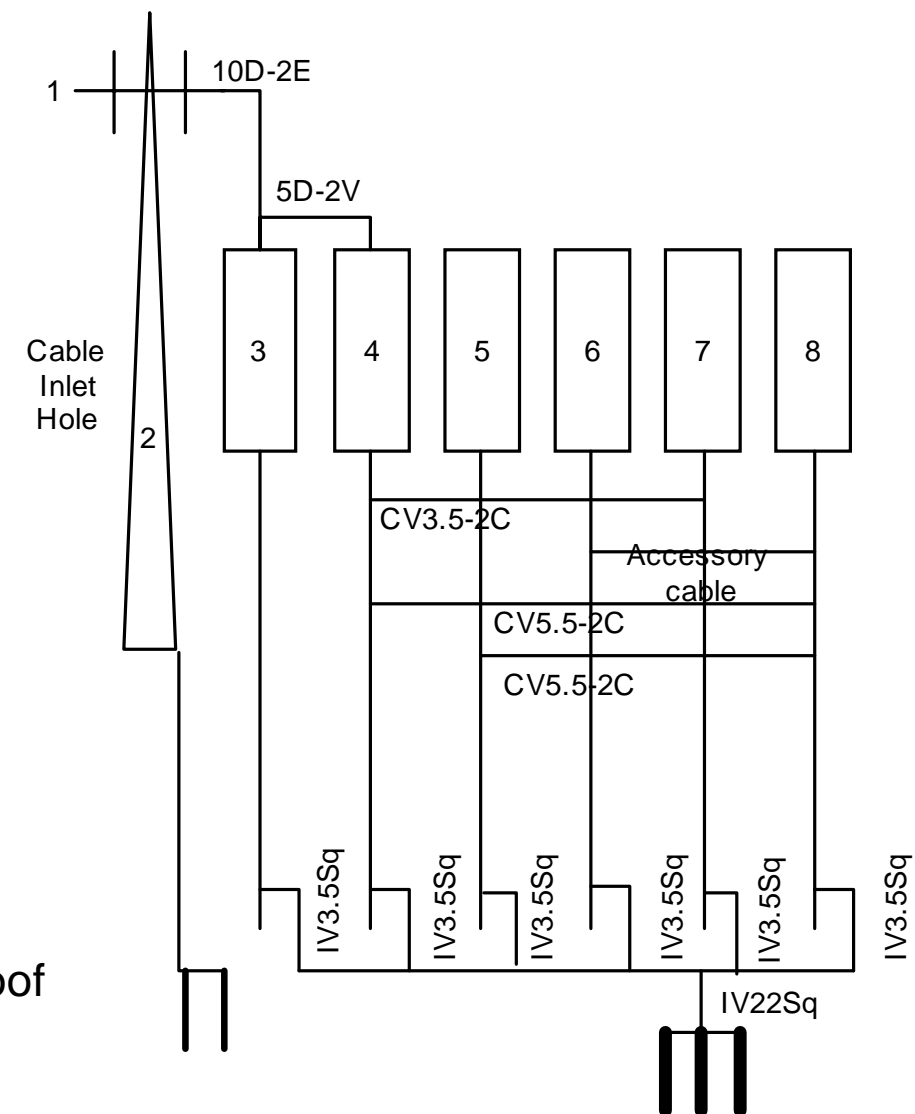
(2) LOCATION PLAN AND CABLE
